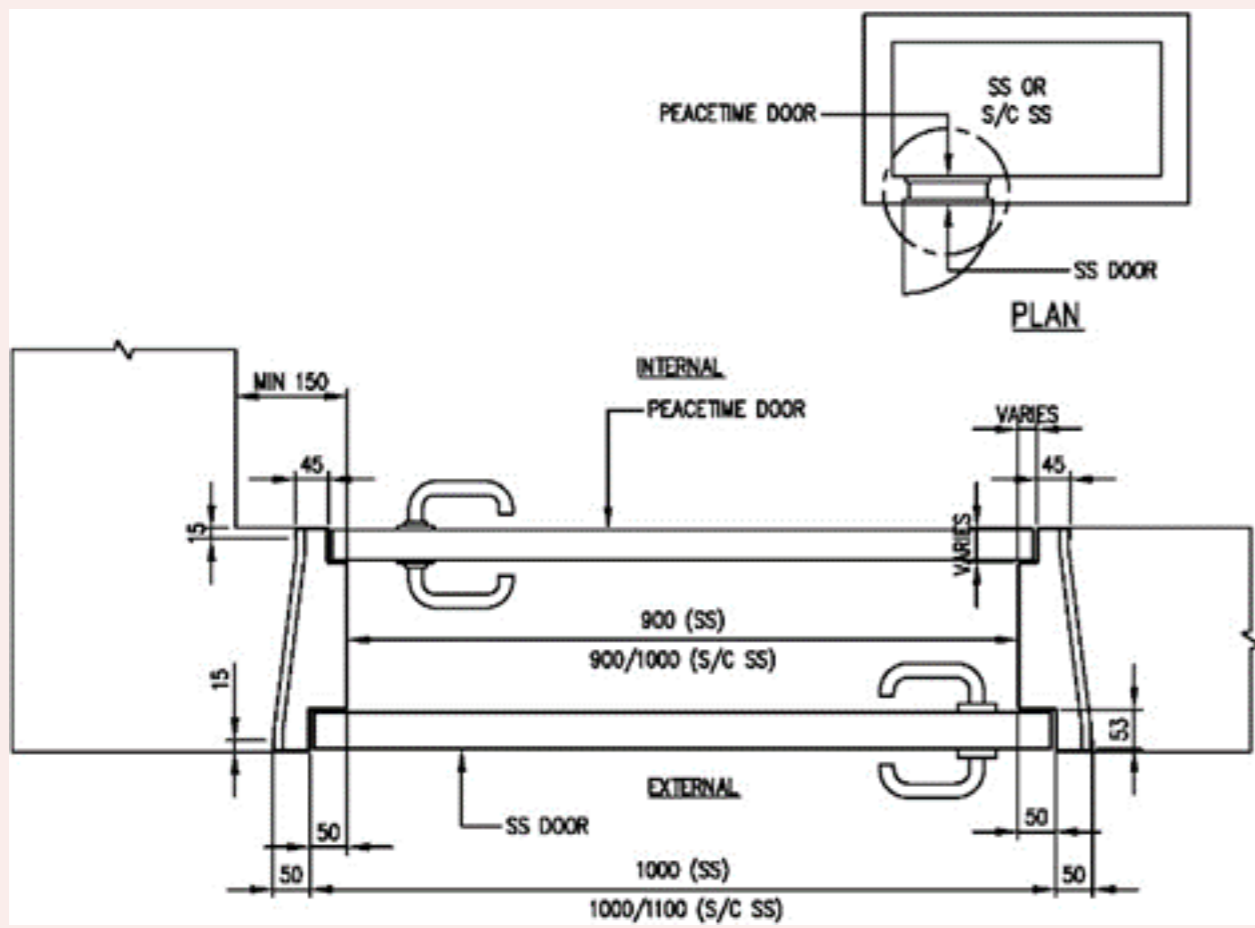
(b): SS DOOR FRAME WITH DOUBLE DOOR REBATES
